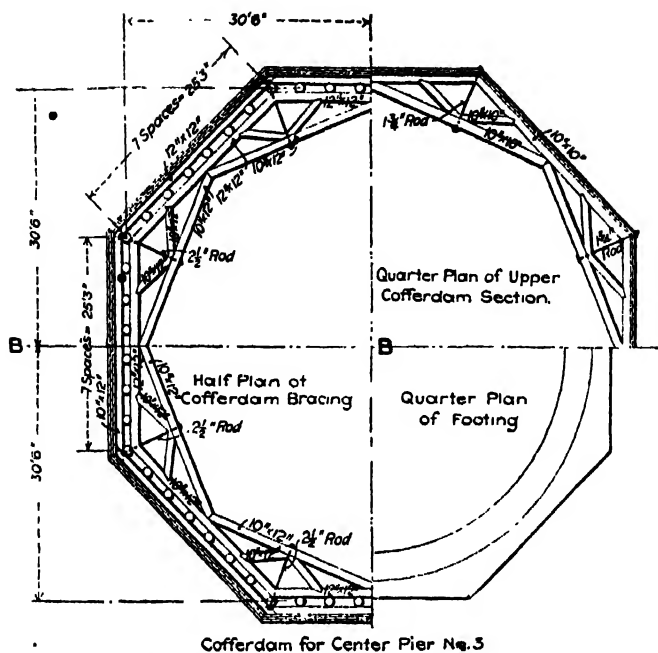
Cofferdams with Single Walls of Timber Sheet-Piling Supported by Wales and Guide Piles, for Piers of Illinois Central Railroad Bridge over Tennessee River, at Gilbertsville, Ky. See also Fig. 64a.
